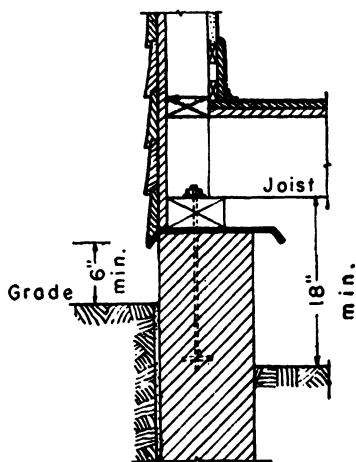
Metal shield over uncapped unit-masonry wall to protect against termites. Metal shields are effective only if made continuous, with no gaps or loose joints. The hole through which the anchor bolt passes should be sealed with coal-tar pitch.
